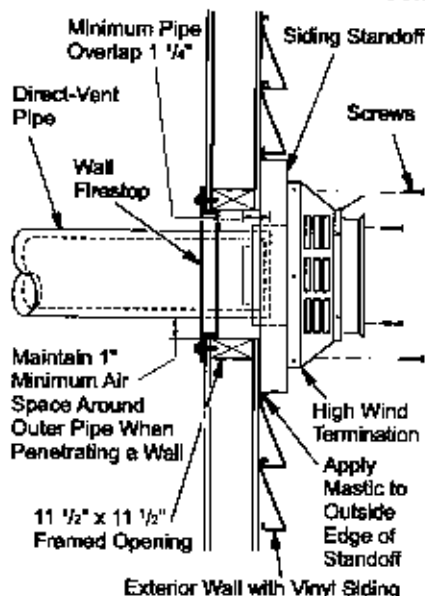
Typical Horizontal Termination Cap Mounting with Additional Siding Standoff Installed
